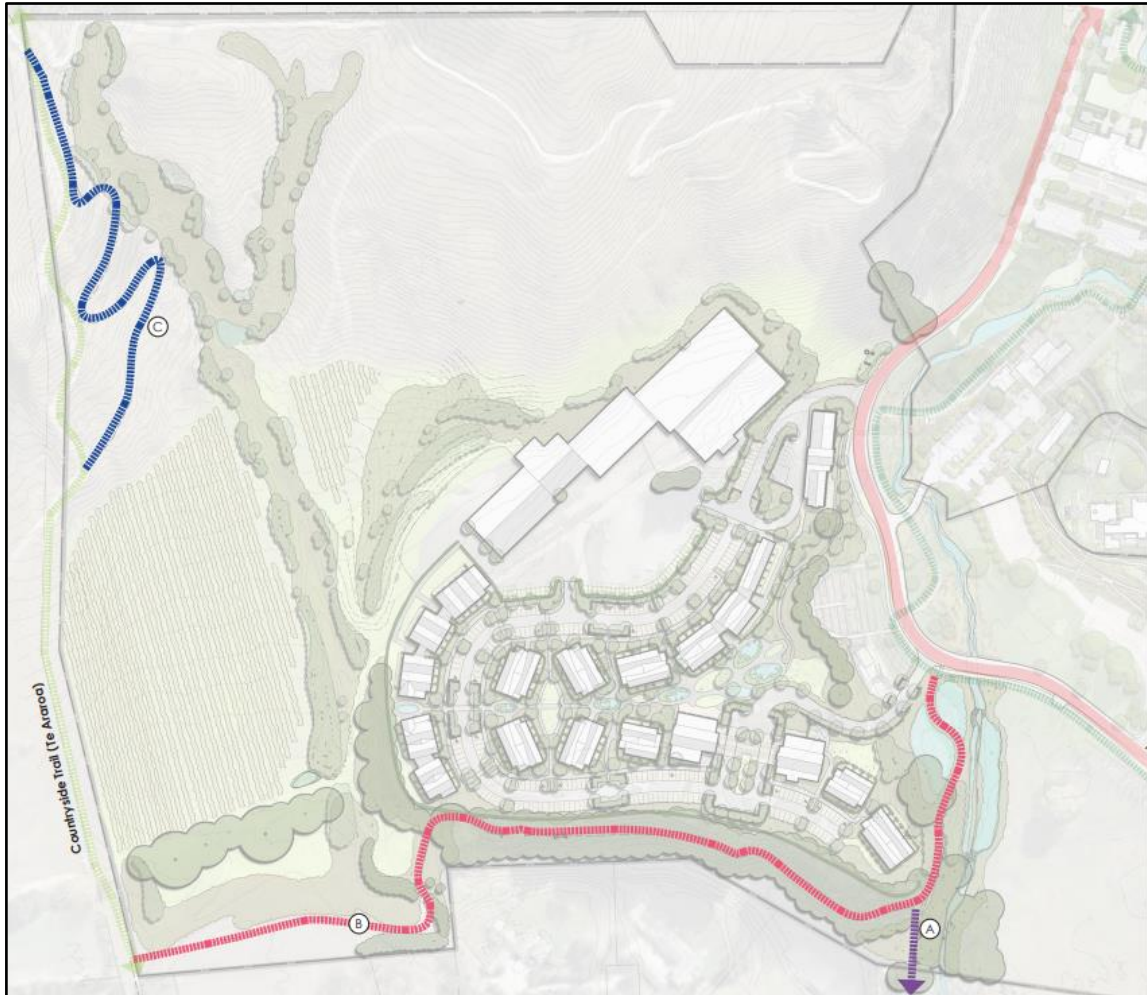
Trail plan showing Trail A (purple), Trail B (Red), and Trail C (Blue). Source: Application, Appendix 7, p.24.
